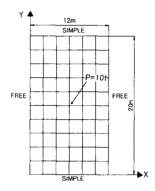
Girders and Beams. Fig.1 Structure under consideration.
